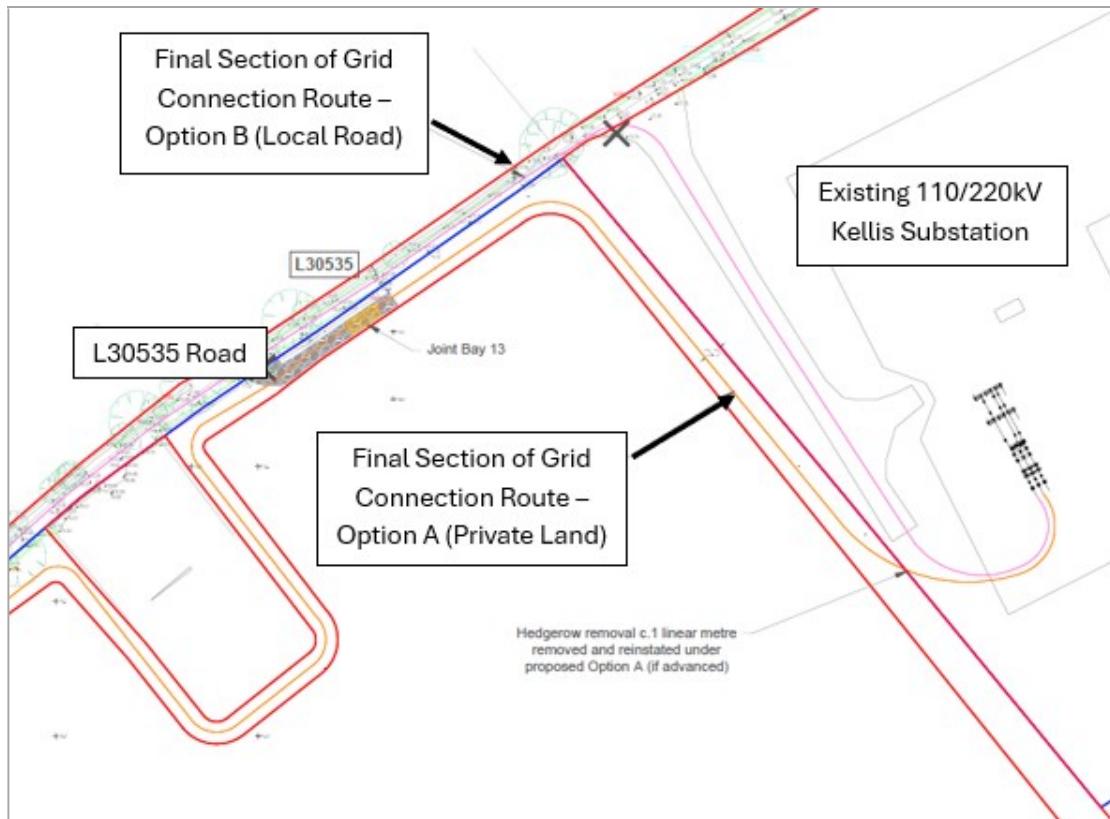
Final Underground Cabling Options on Public Road / Private Lands
